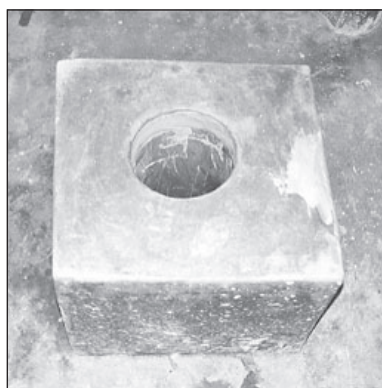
Fixed toilet seat. Note PVC pipe lining drop-hole.
